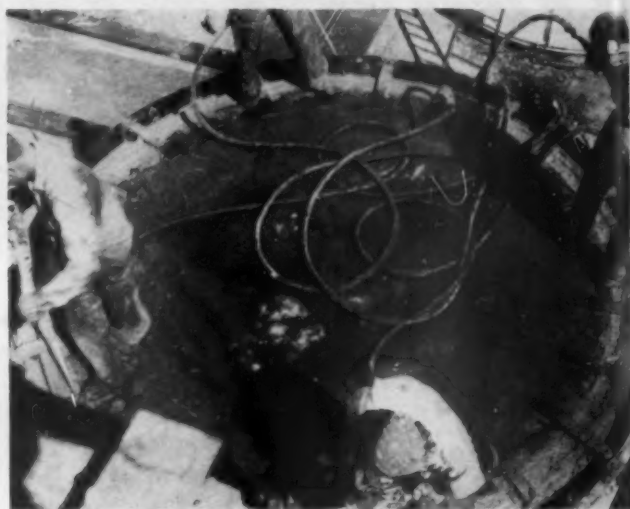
, right: Four men with pneumatic drill rods were employed on each pipe
